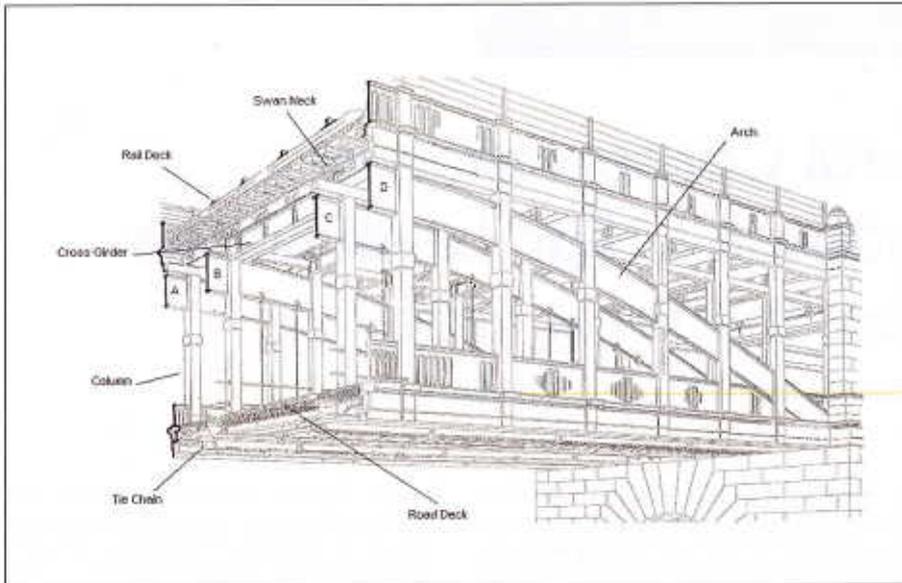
Isometric cross-sectional drawing of a High Level Bridge span.
